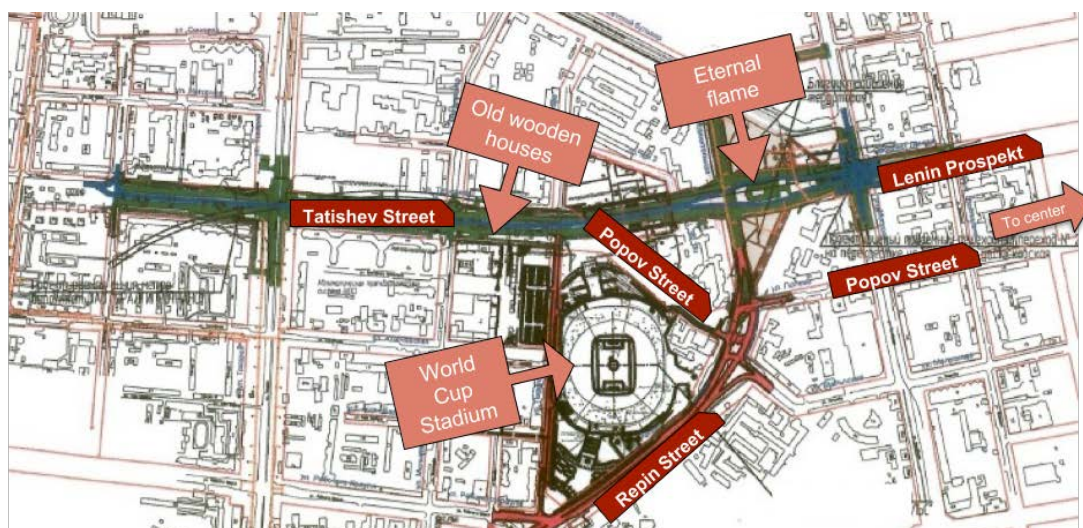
Project plans showing how Tatishev Street was to join Lenin Prospekt in the area around Ekaterinburg’s World Cup stadium. Note the eternal flame surrounded by new streets over the former park, and the old wooden houses on Tatishev Street that were demolished. Sources: Ekaterinburg Municipal Administration, author.
